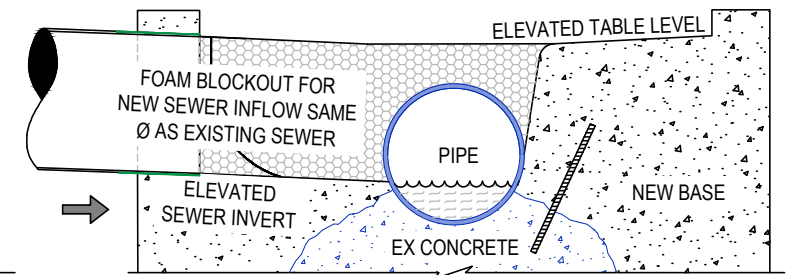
F2: BASE CONCRETE IN PLACE, CONCRETE EMBEDMENT AT LATERAL CONNECTION
